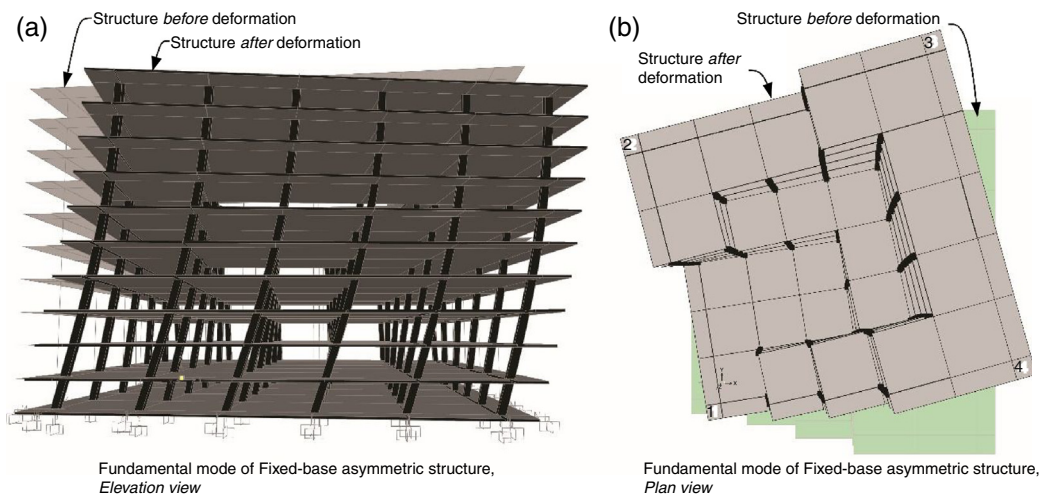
Fundamental mode of vibration of the fixed-base asymmetric structure: (a) elevation view; (b) plan view.
